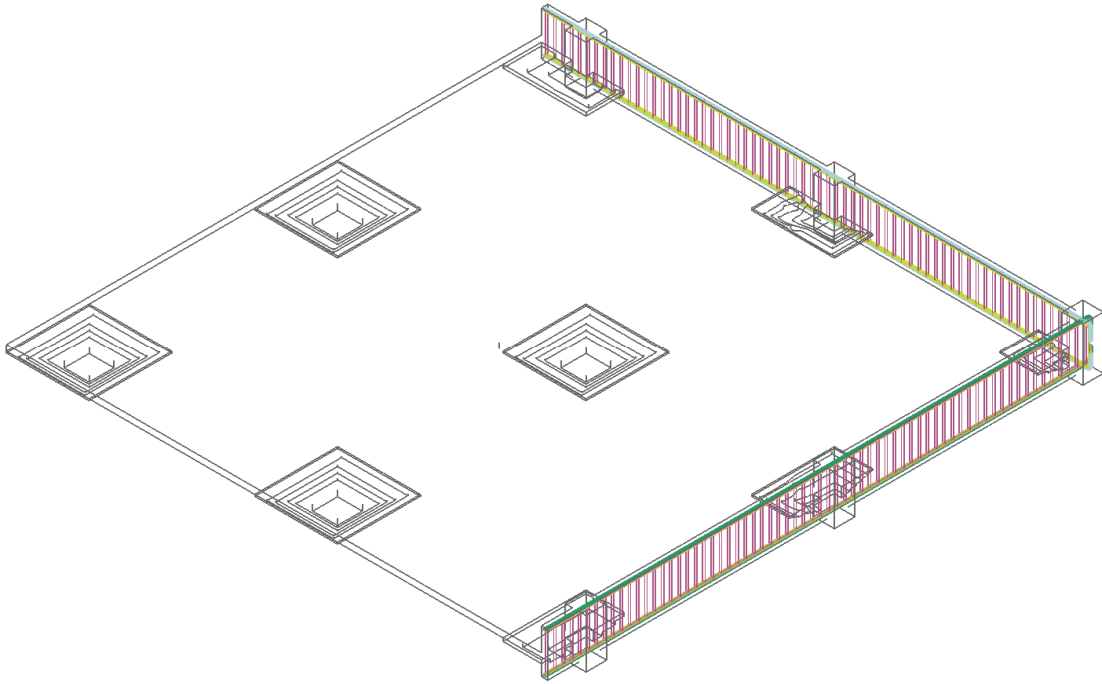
Isometric view of the beam rebar along the spandrel beams. Note: an outline of the concrete model is shown in grey. Elastic columns are not shown.
